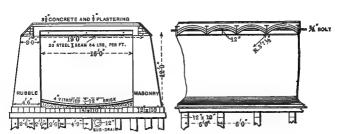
CANAL STREET SEWER; ST. PAUL, MINN.
